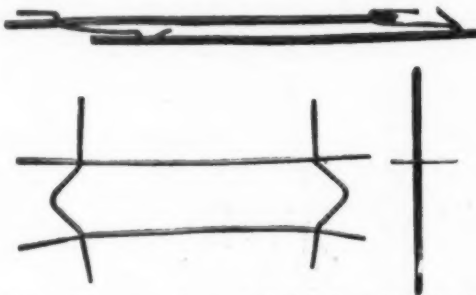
These are pieces of electrically-welded fabric which have been twisted and distorted out of shape without in any way impairing the solidity of the weld. There is also shown at the right a piece which has been tested almost to the breaking point. The wire has yielded at a point other than at the weld.
